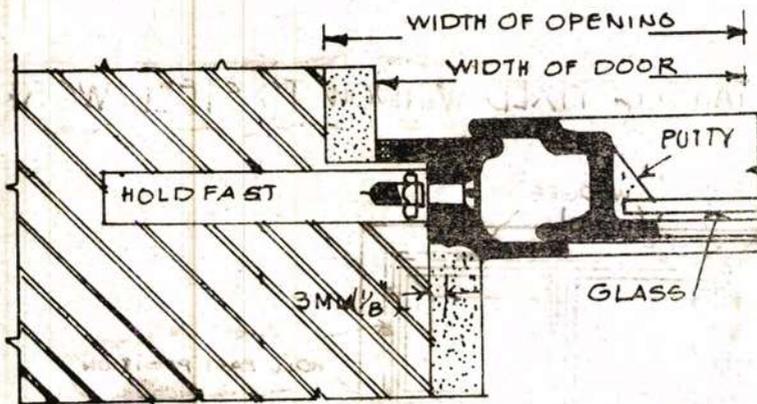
MASONRY OPENINGS REBATED WITH RENDERING
